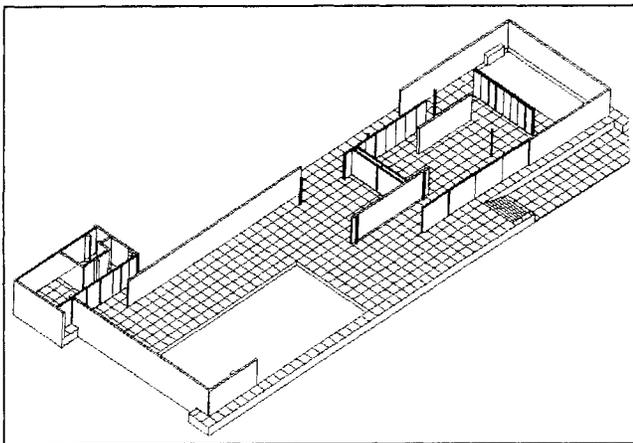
Stage 4 - Second Draft Plan; paths and spaces redefined, structural elements added, roof omitted
